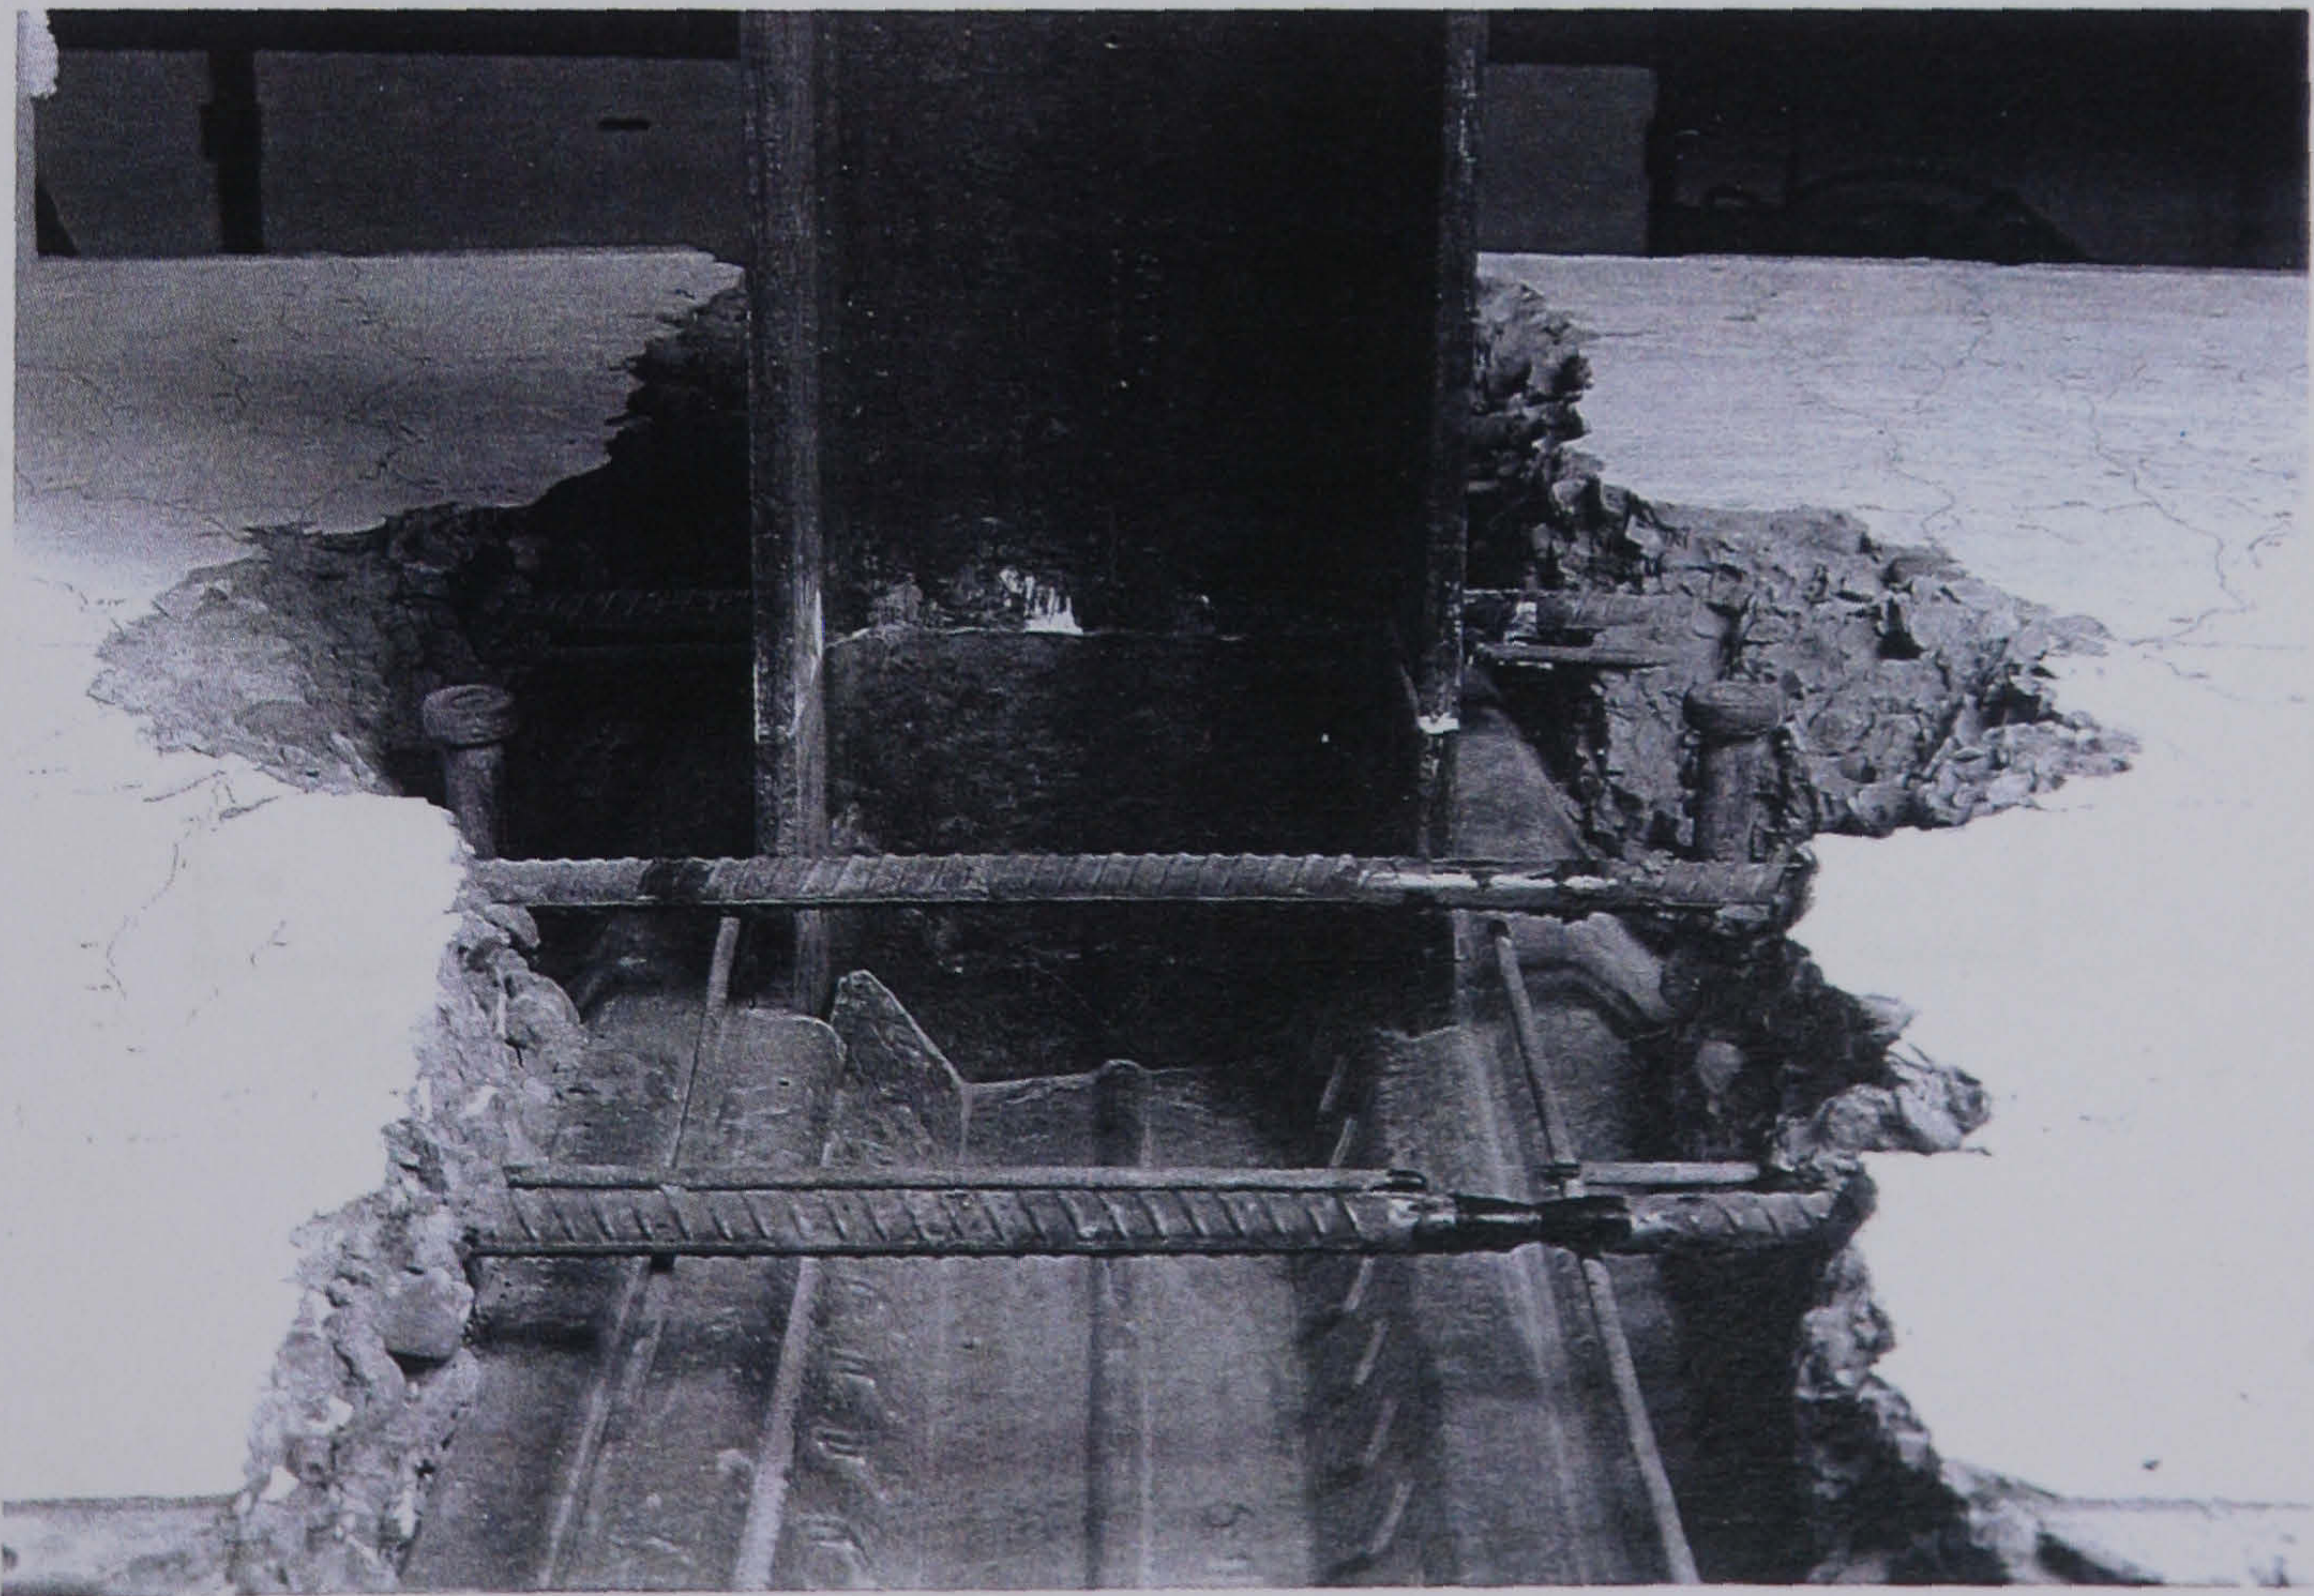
Test 4: fracture of rebar (front)
